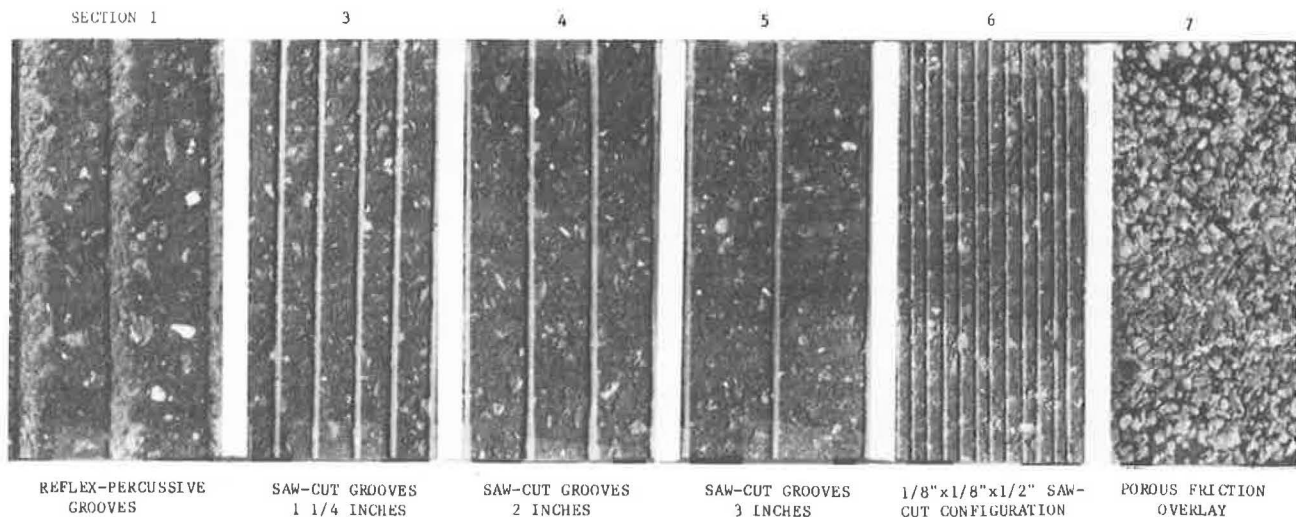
Various test sections of the 300-ft asphaltic concrete test bed (each section is 40 ft long).
